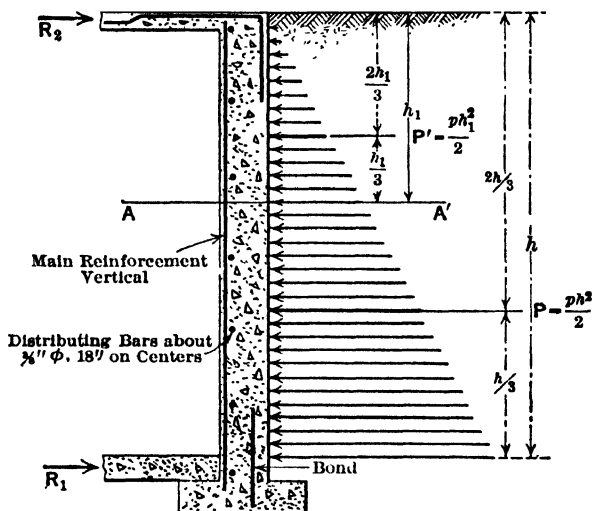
Diagram of Basement Wall Subjected to Earth Pressure out Without Surcharge
